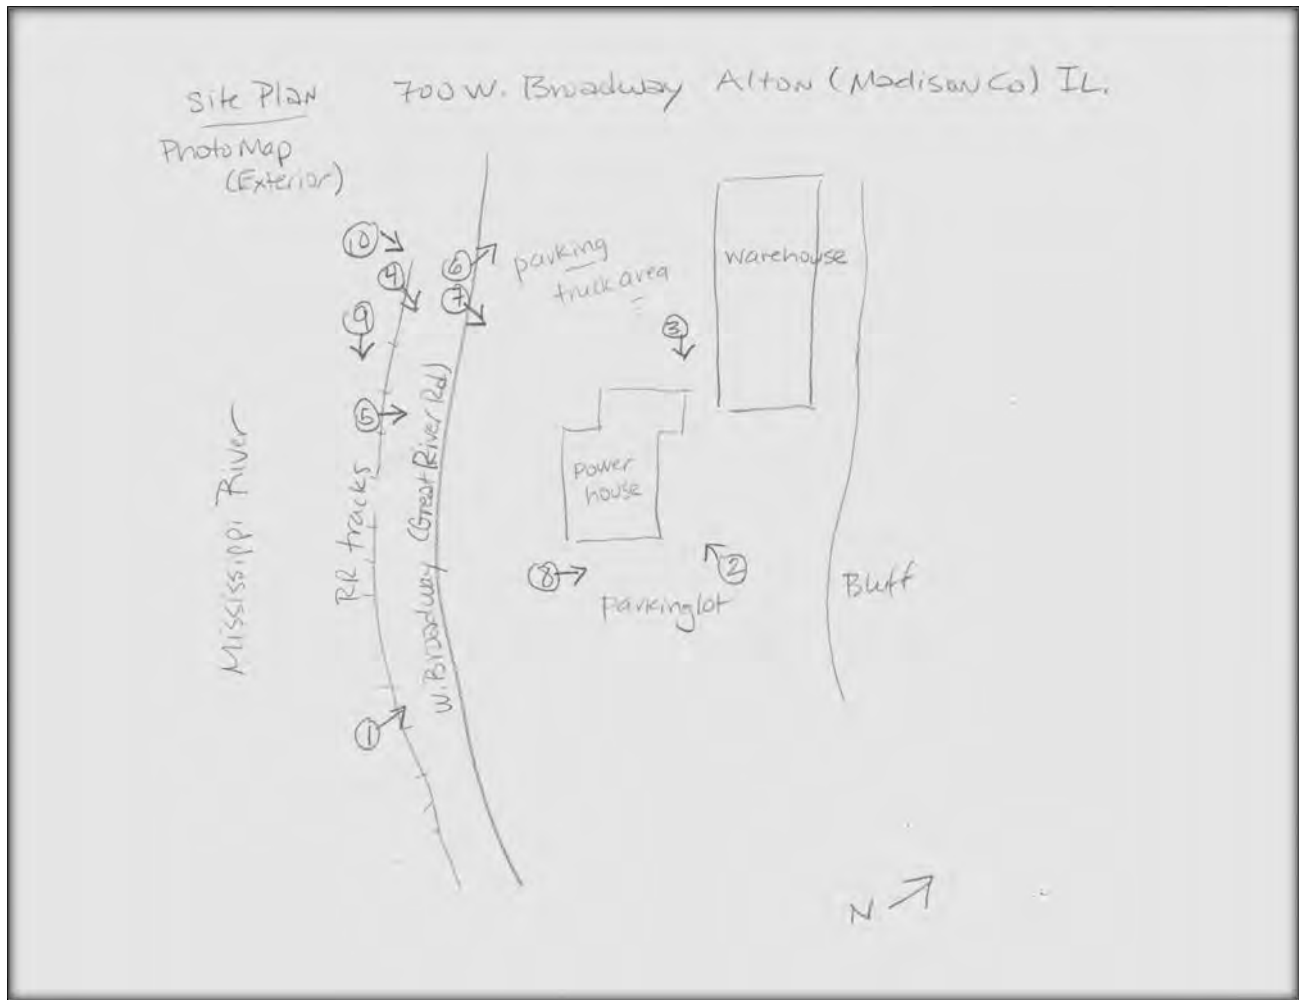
Site Plan and Photo Log (Exterior). Alton Gas & Electric Power House, Madison County, Illinois.
